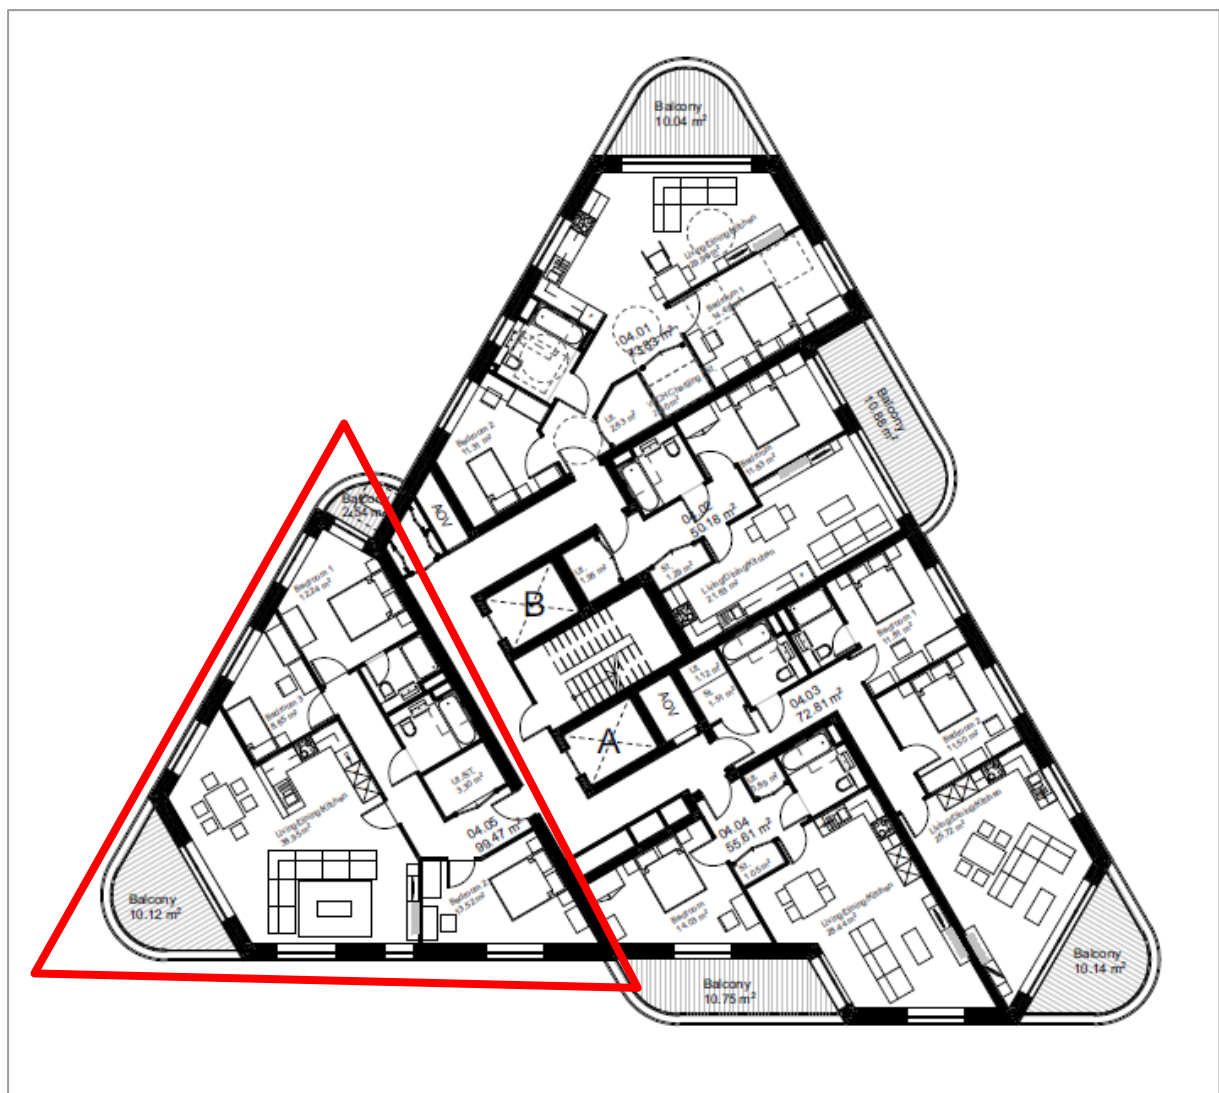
4th floor plan, B.04.06 dual-aspect west facing 3bed apartment (Source: Stock Wool Architecture 17.12.2020).
